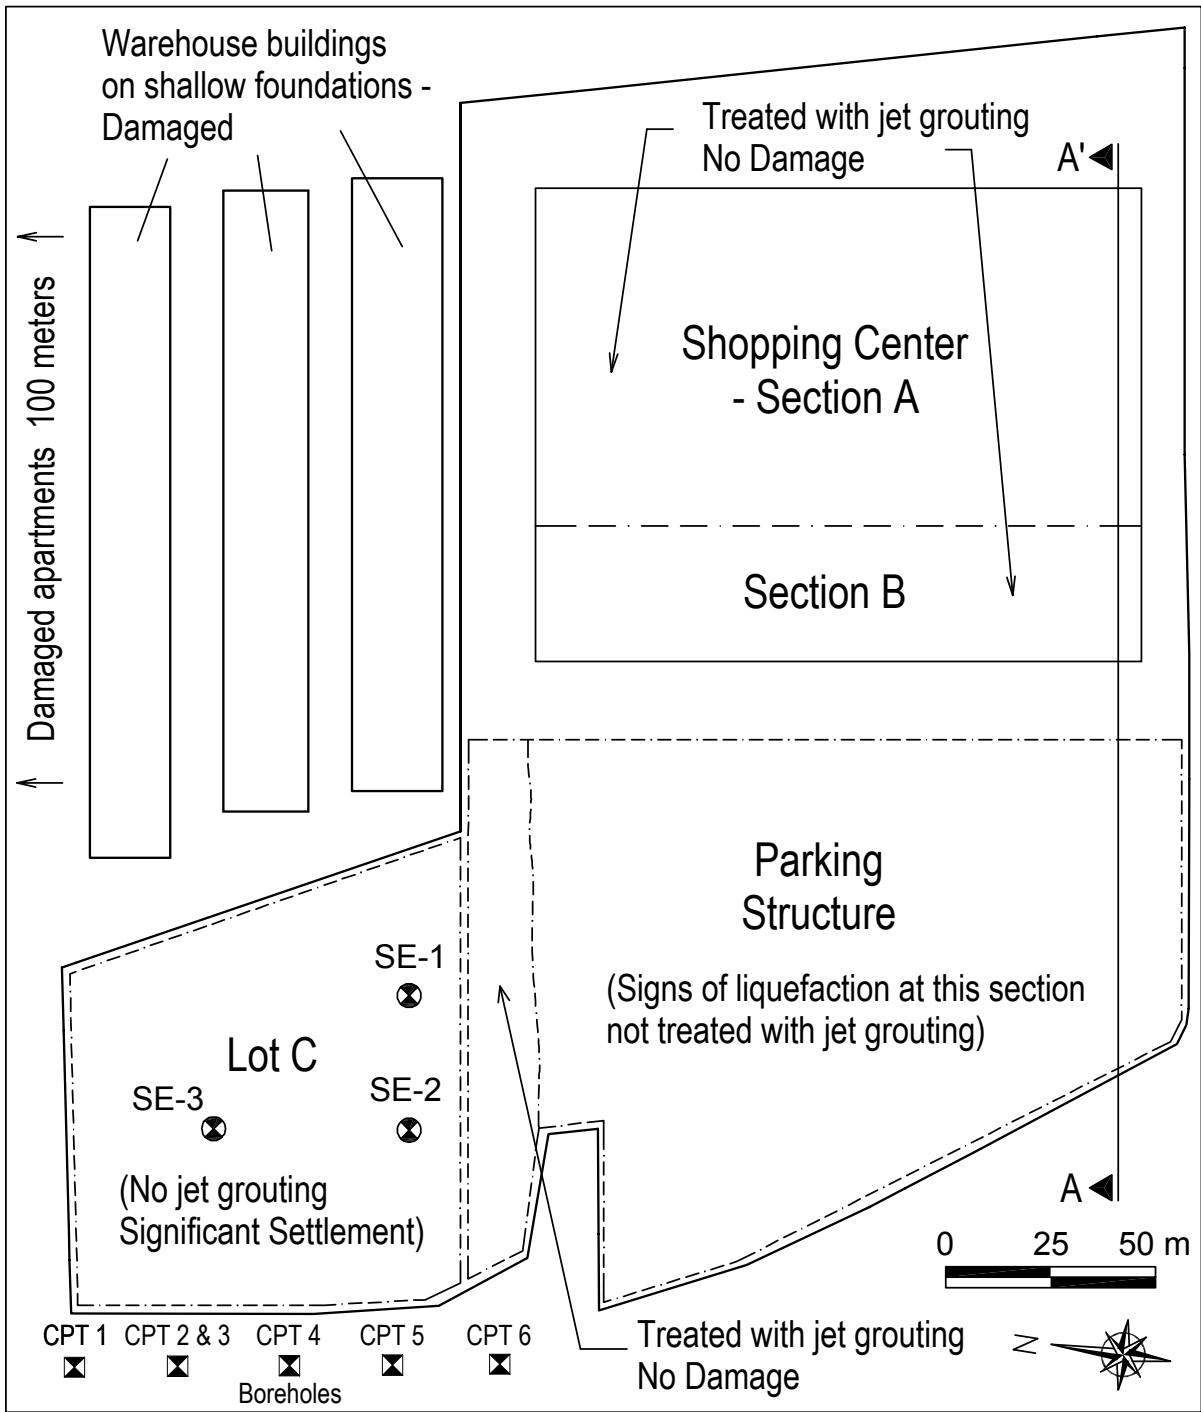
Site plan of Carrefour Shopping Center showing improved area and unimproved areas along with observed earthquake damages. Locations of post-earthquake soil investigations are also indicated.
